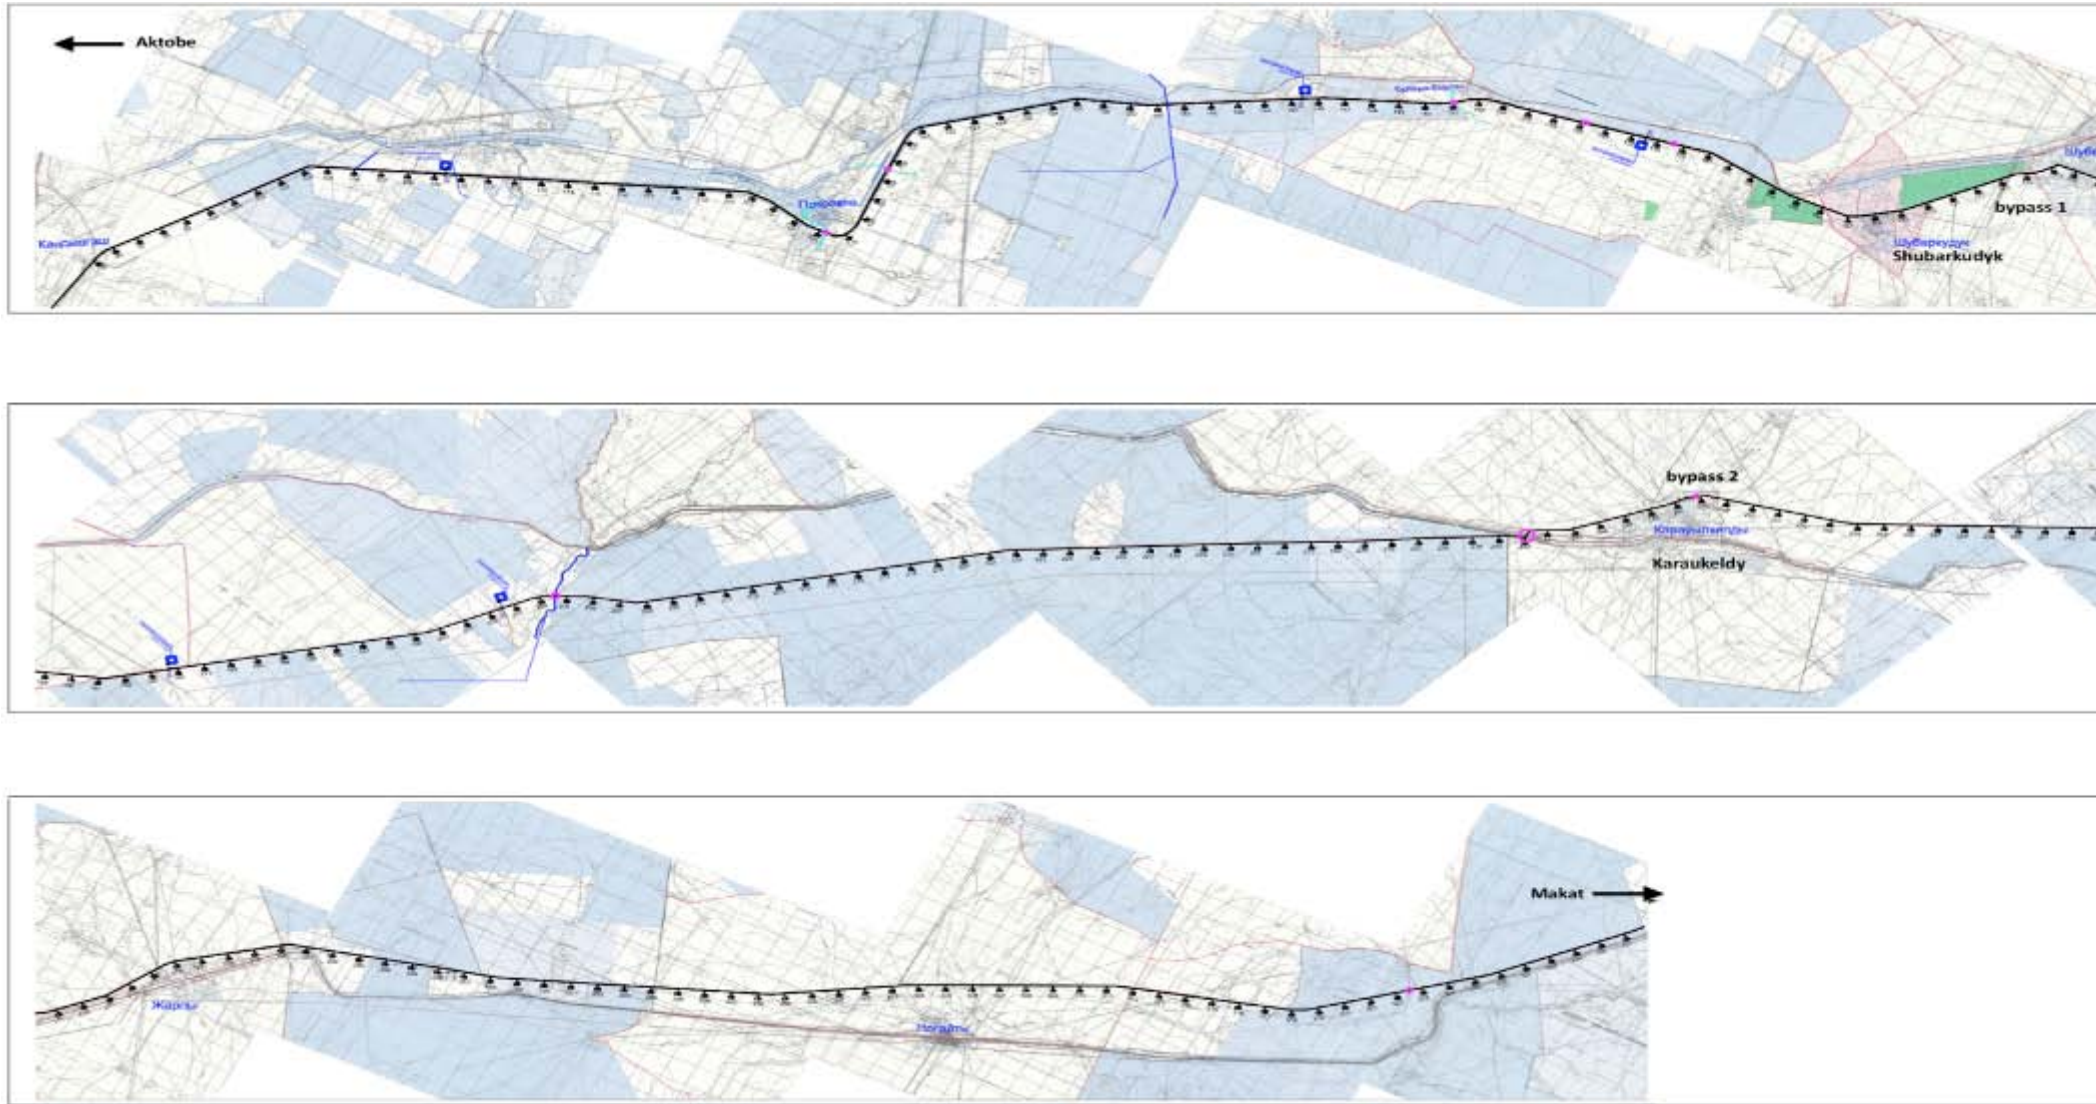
Road section in Atyrau oblast (km 330 – km 458)
